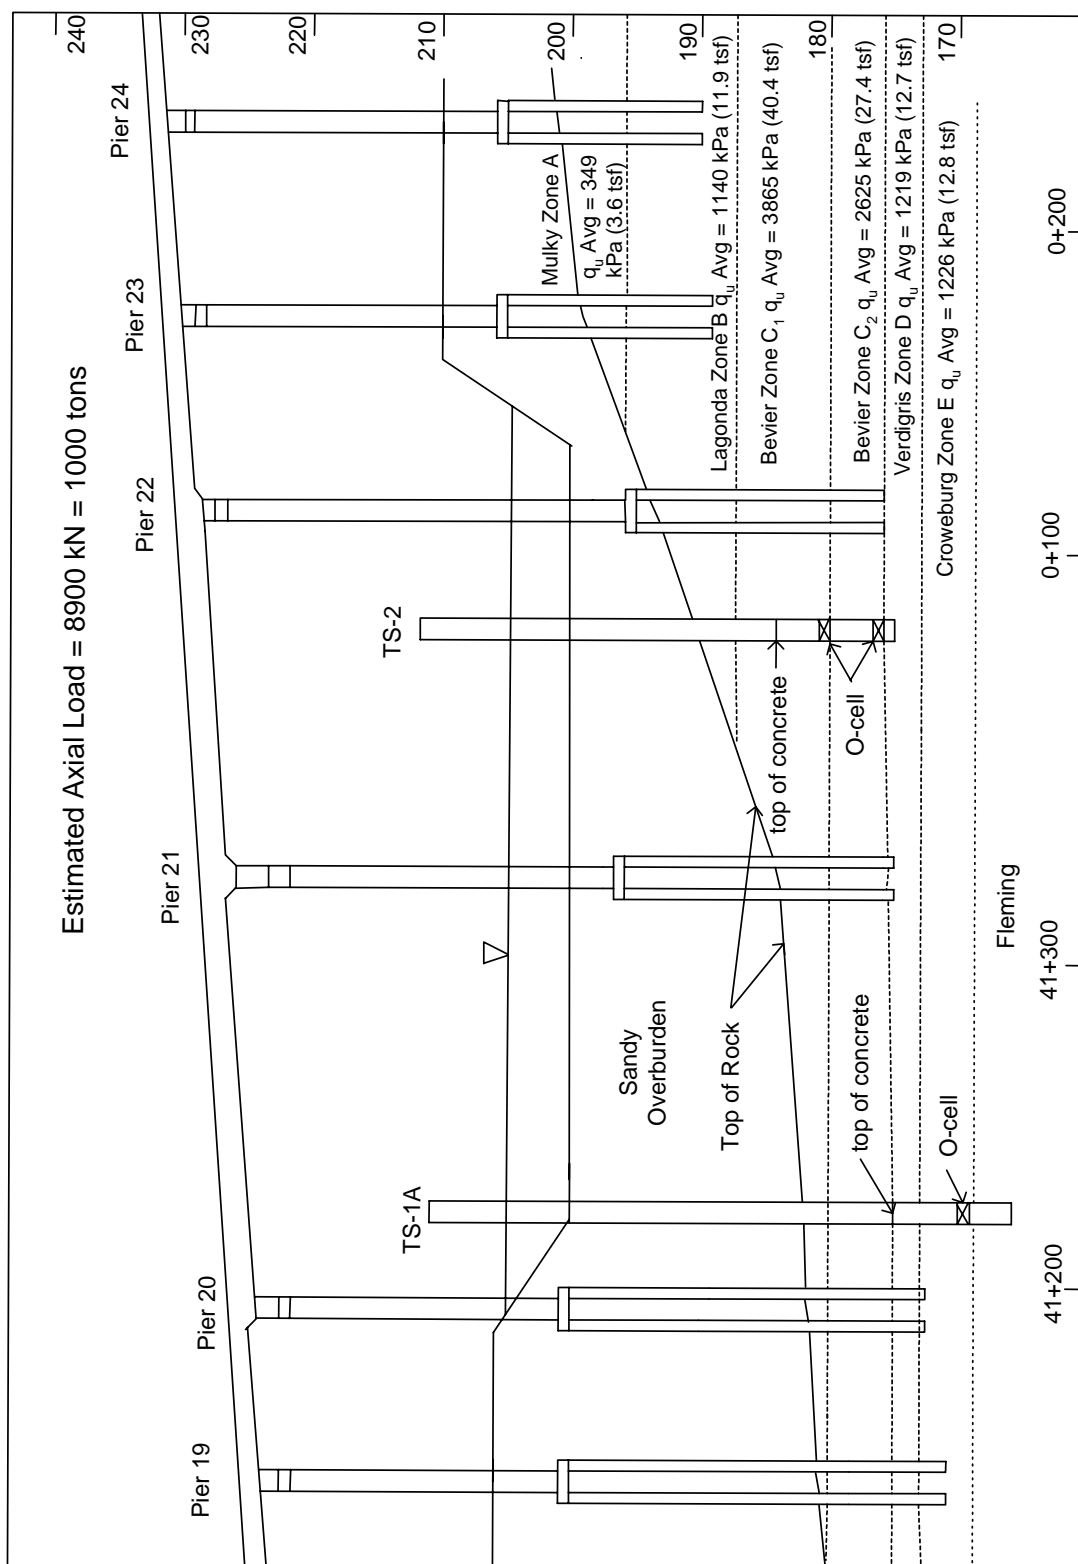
Elevation view of bridge showing piers 19 -24 and test shafts TS-1A and TS-2.
